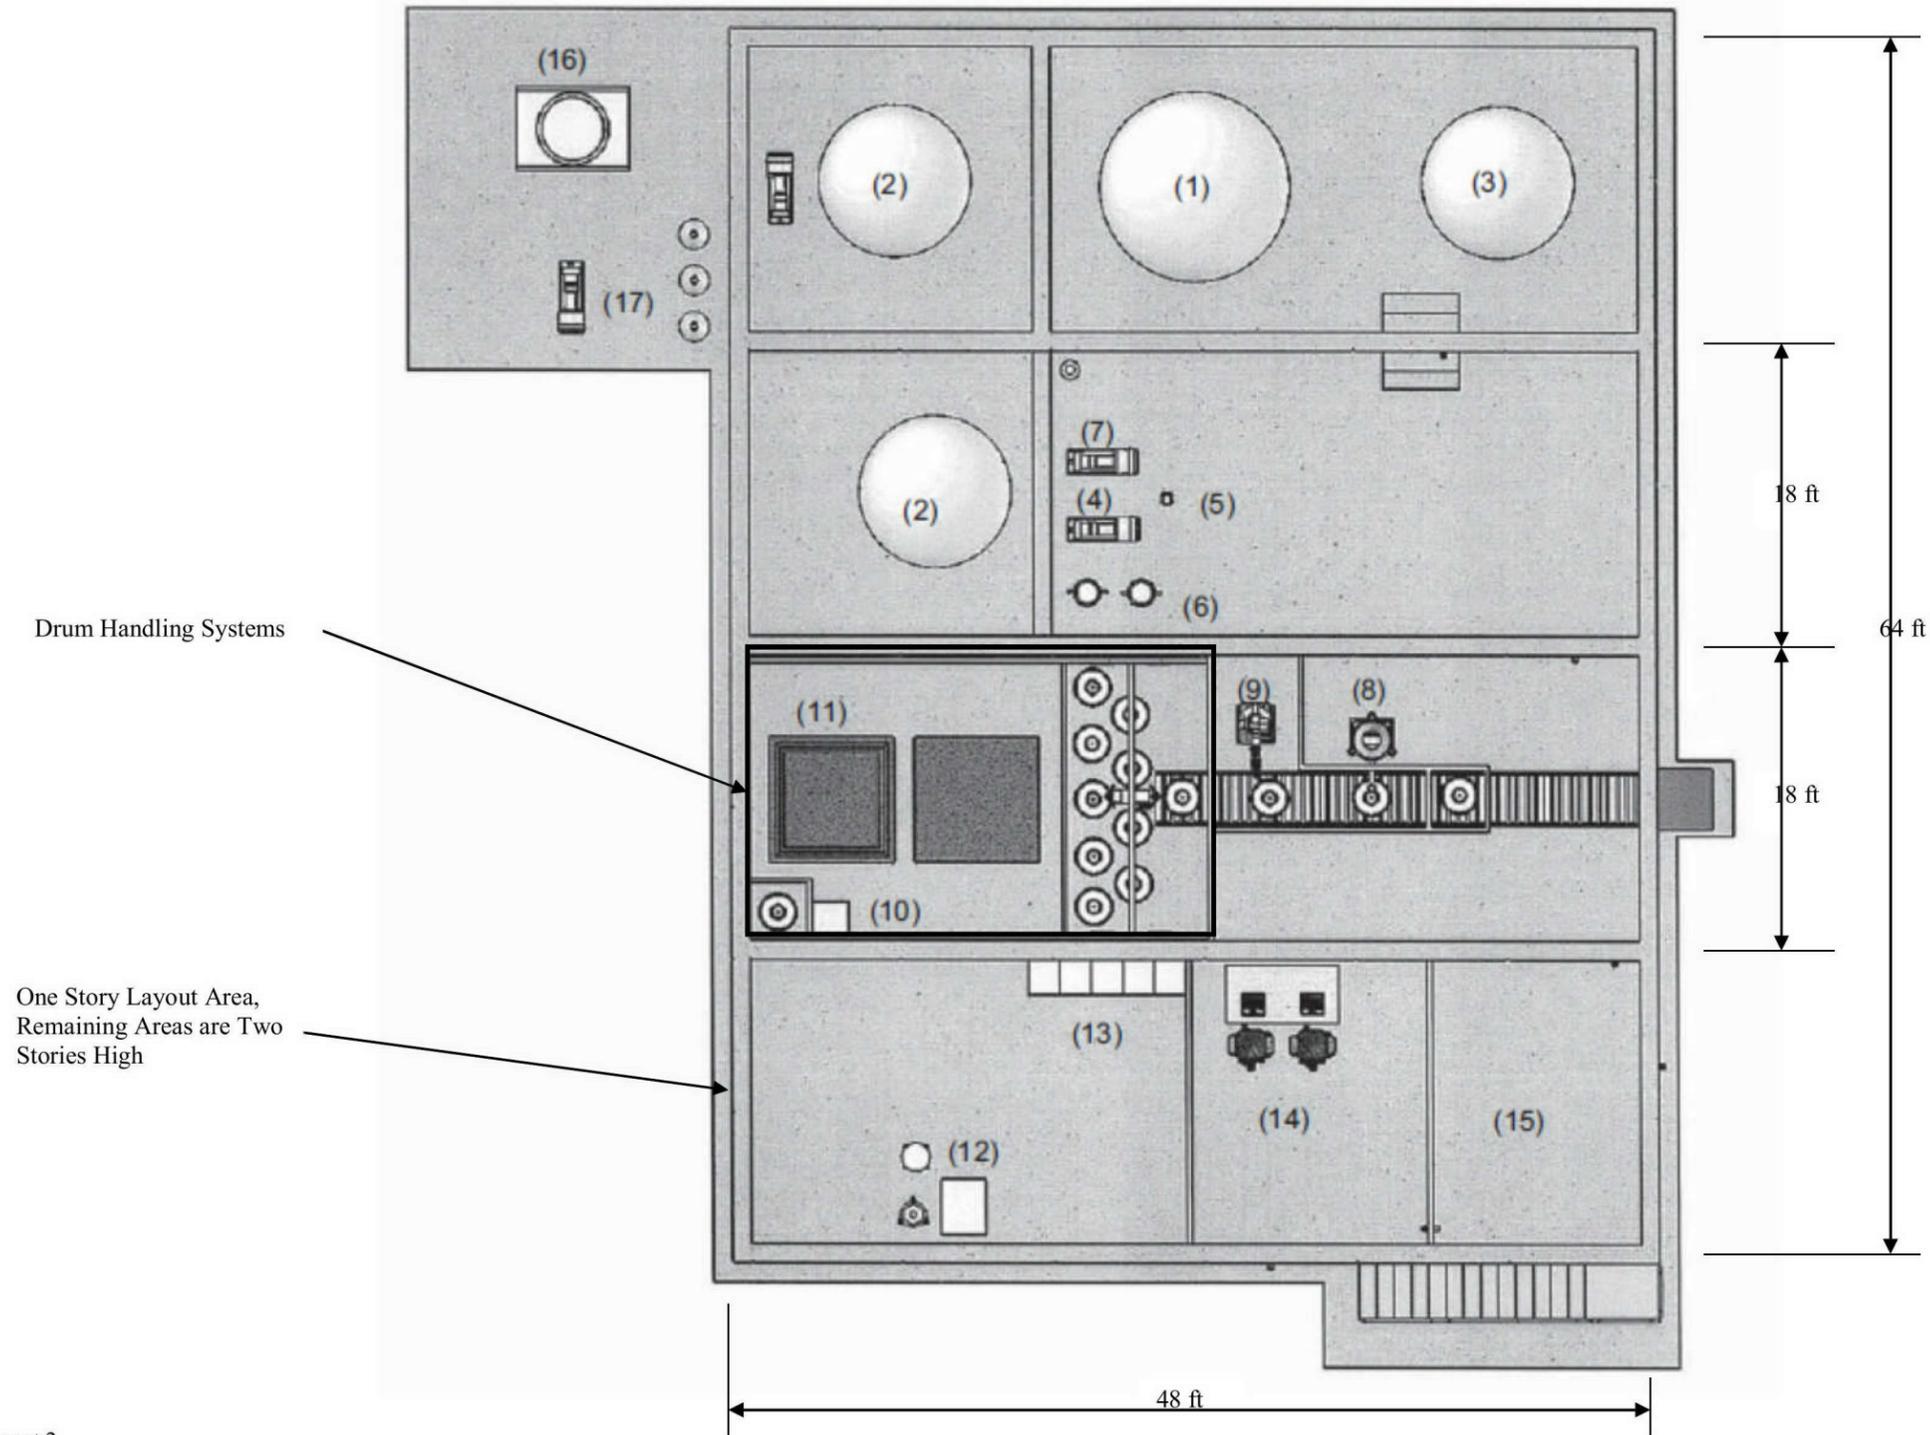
Preliminary Purpose Built Facility Layout for the Warm Water Oxidation Sludge Treatment Alternative.
